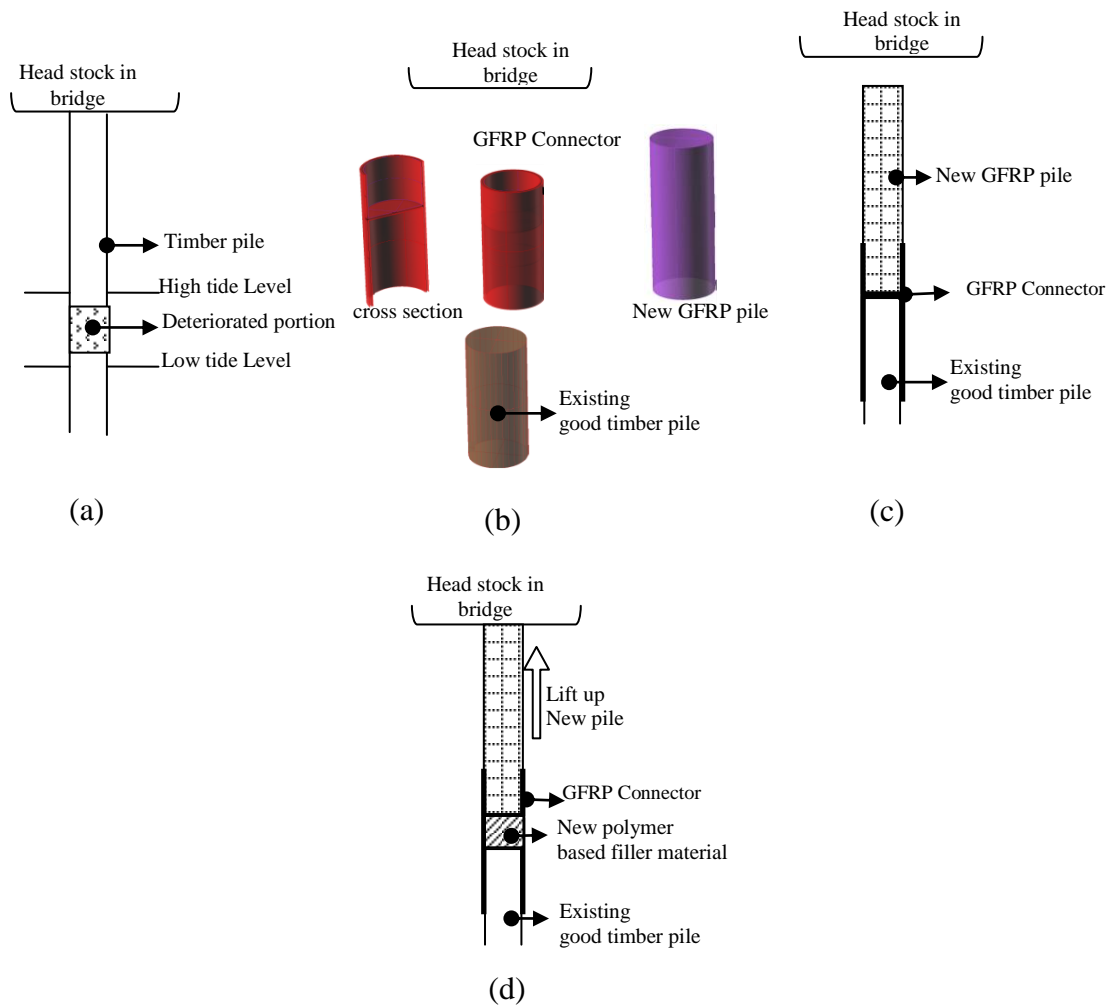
(a) General layout of the deteriorated timber pile, (b) Typical components used in pile rehabilitation, (c) Installing FRP connector and new pile in to the remaining non deteriorated timber pile, (d) Filling new polymer base filler material in to the connector.
